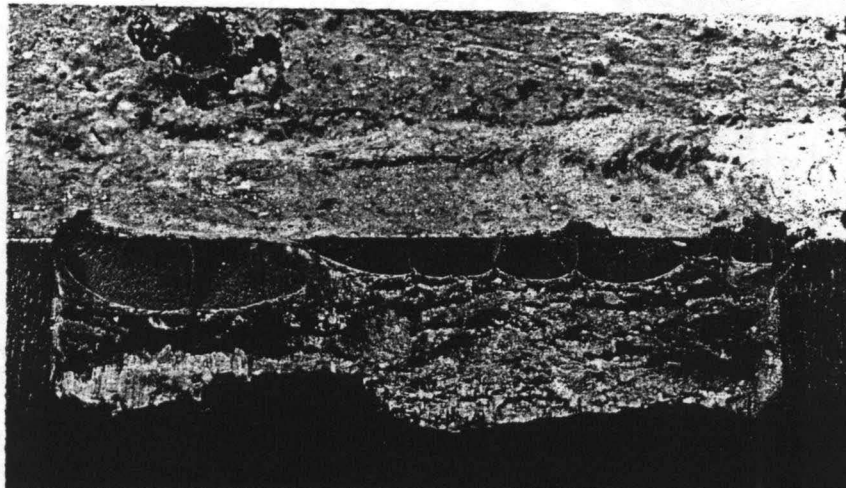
Multiple Fatigue Crack Growth at Toe of Stiffener-to-Tension Flange Fillet Weld²⁰
